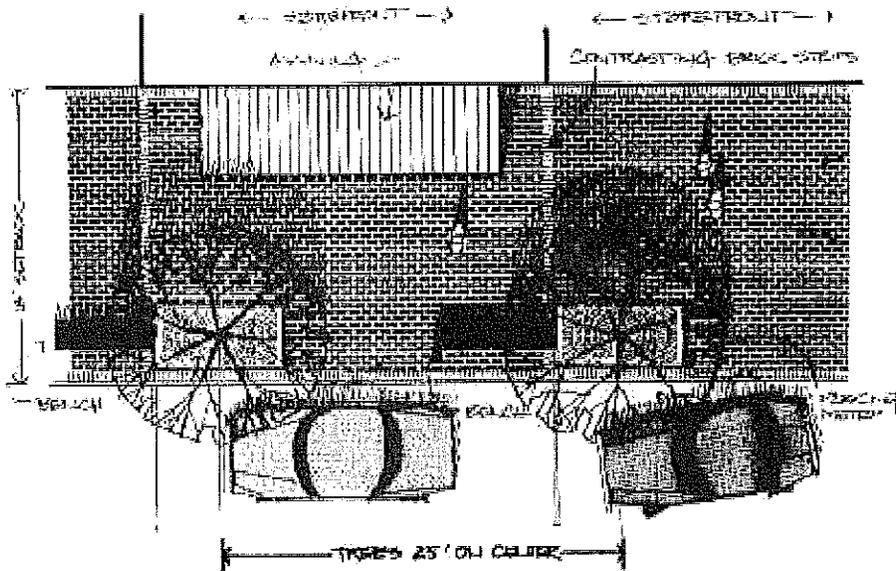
SAMPLE STREETSCAPE IN PLAN VIEW. Note location of trees to avoid interfering with opening passenger doors on parked cars.
